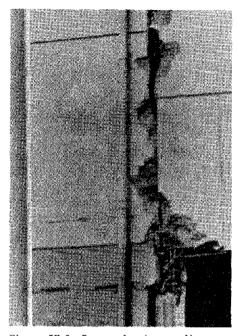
Damage due to pounding, Anchorage Westward Hotel, 1964 Alaska earthquake.
